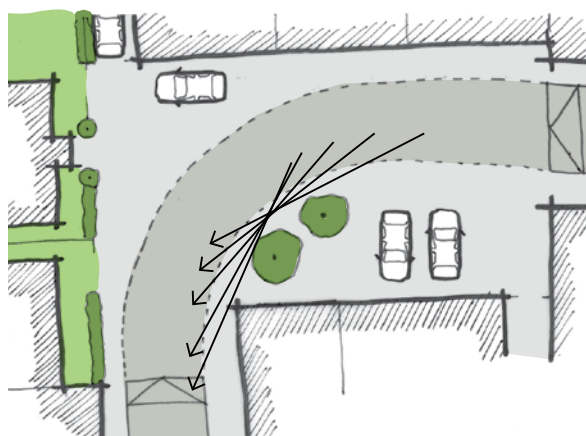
Stopping sight distance defining the geometry of the curve and placing of trees/ building lines
